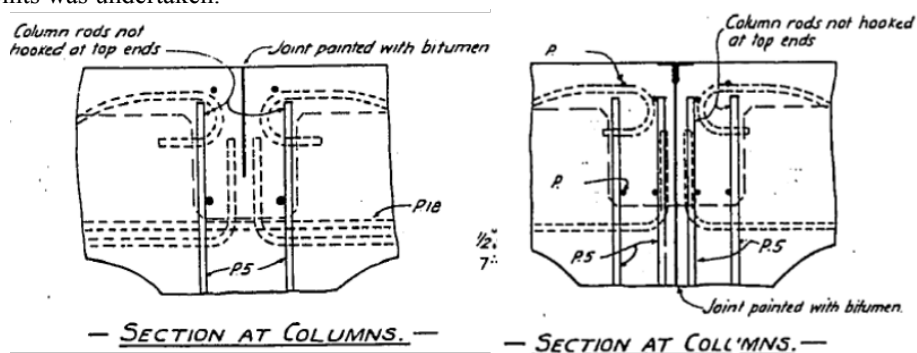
Typical beam reinforcement at pier and split pier joints of Rakaia and Rangitata River Bridges.
